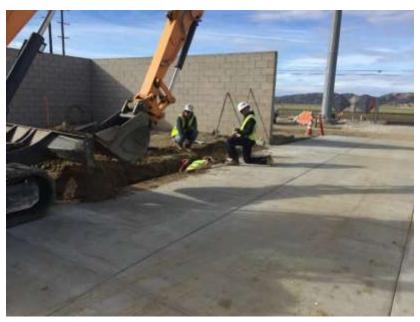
Henkels and McCoy conducting trenching and conduit placement for the Substation driveway gate.
